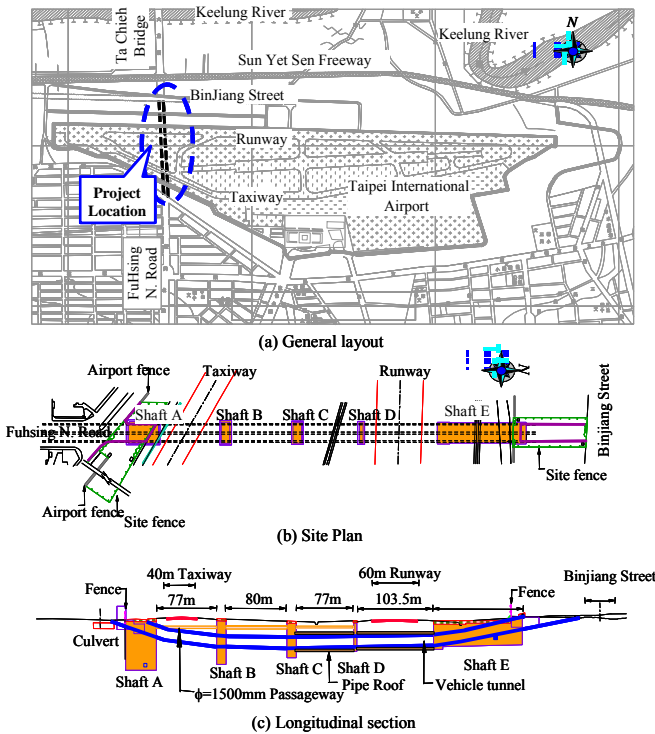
Layout and Profile of Vehicle Tunnel along Fuhsing North Road
